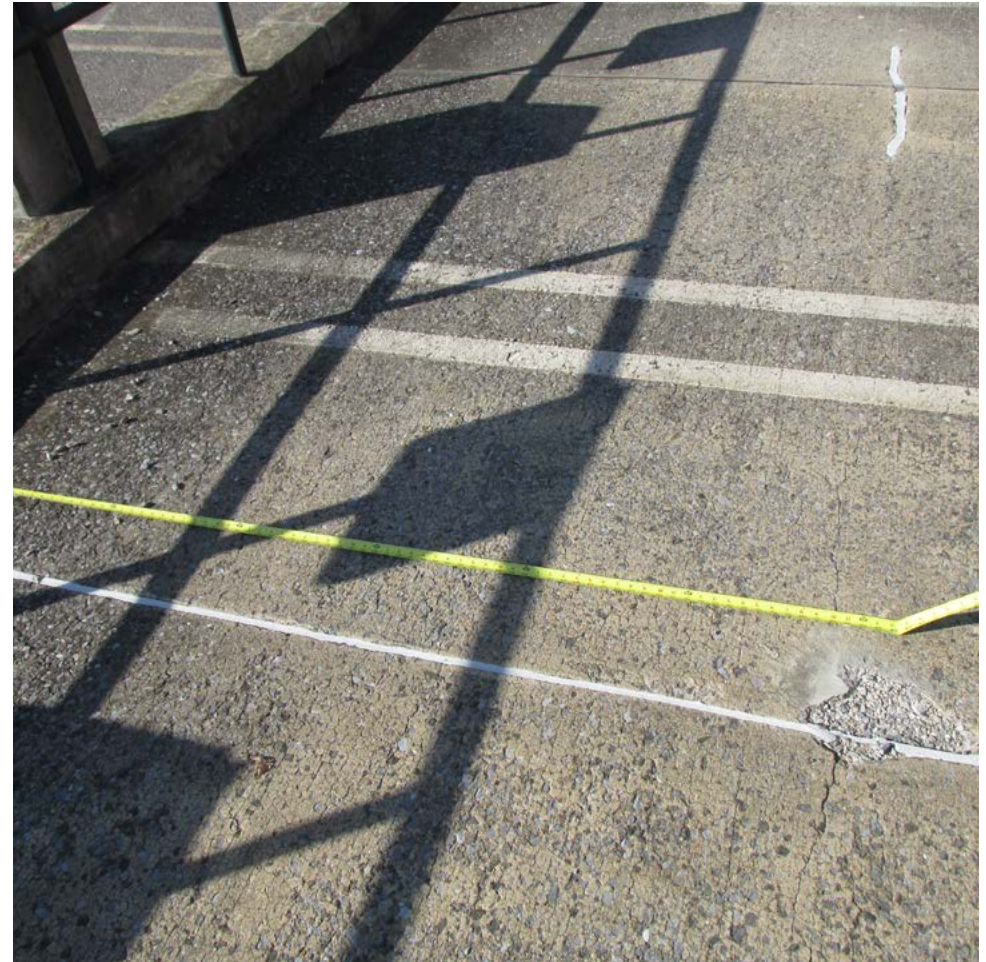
View of the topping slab of the parking garage along the ramp from the upper level down to the middle level. This picture was taken looking towards the southwest. We noted that at a number of locations spalled concrete topping slab and/or cracks in the concrete topping slab existed approximately 7'-0" from the end of the precast concrete single tee planks.
